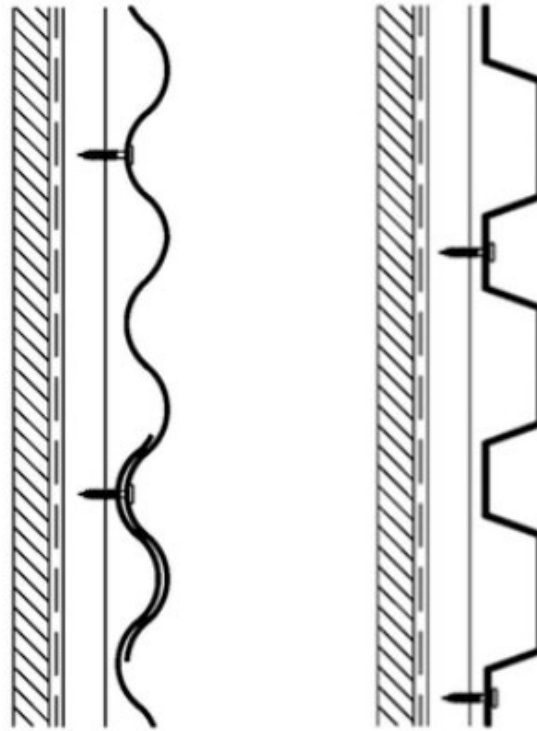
A typical convex/concave and trapezoidal corrugated sheet is above.
